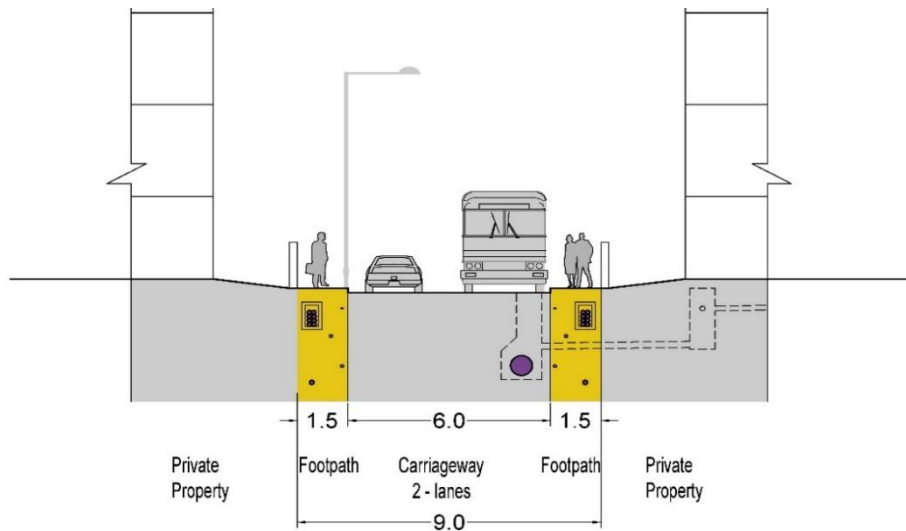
TYPICAL SECTION OF 9M WIDE ROAD
